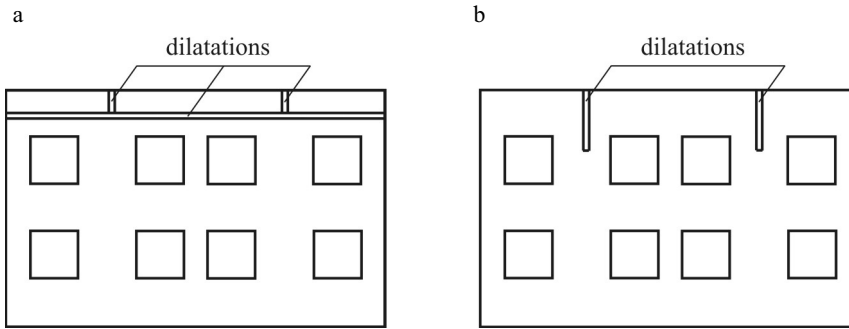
Example of placing dilatations in a building with ventilated flat roof (elaborated basing on Starosolski [1976])
